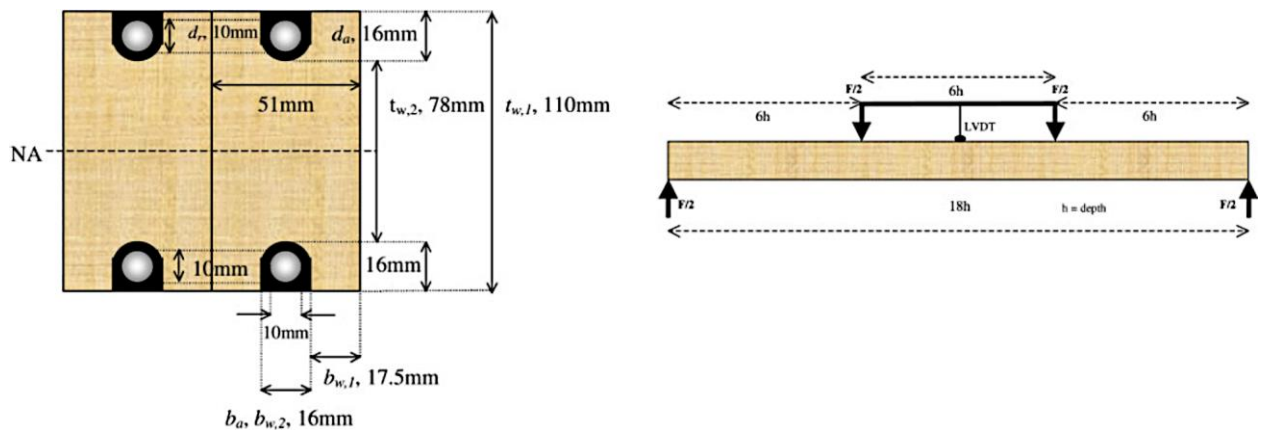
Reinforced cross section and test set up in a study by (Alam et al. 2013).
